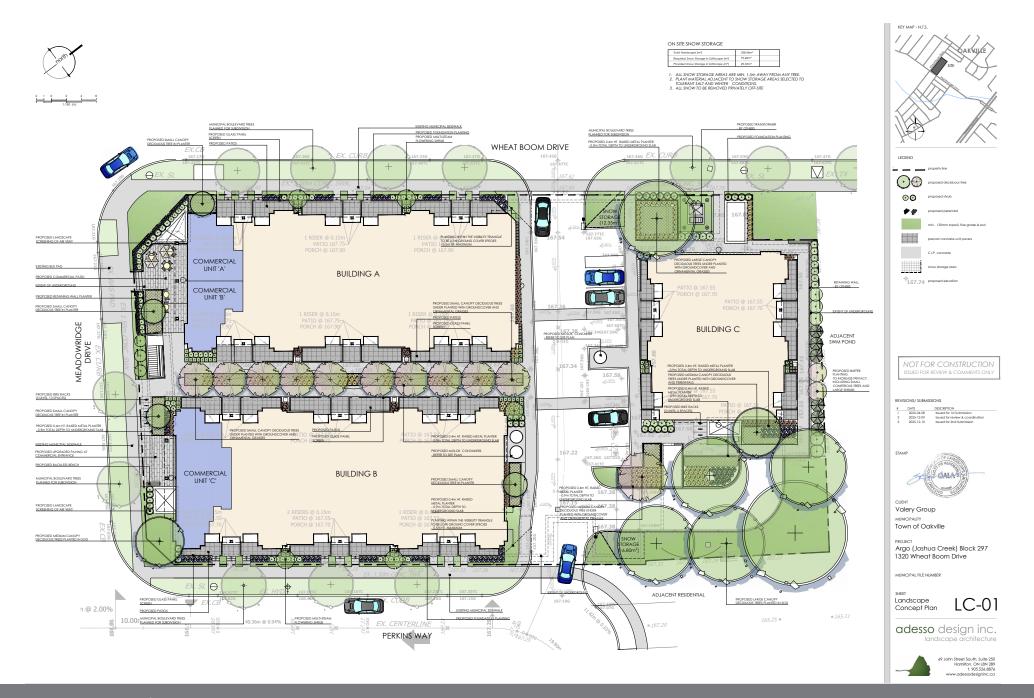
Joshua Creek 1320 Wheat Boom Drive Landscape Plan
